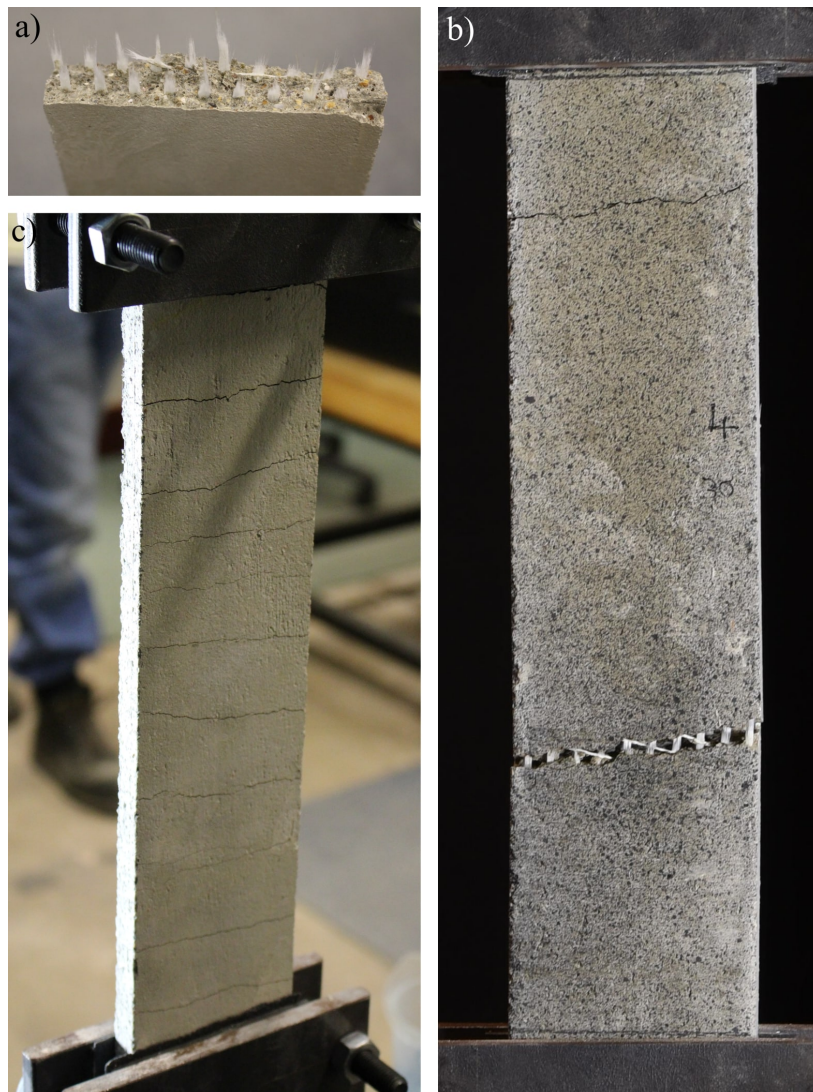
Images from tensile TRC tests, showing a) failed 15mm thick specimen, b) failed 30mm specimen and c) cracked 15mm specimen prior to failure.
